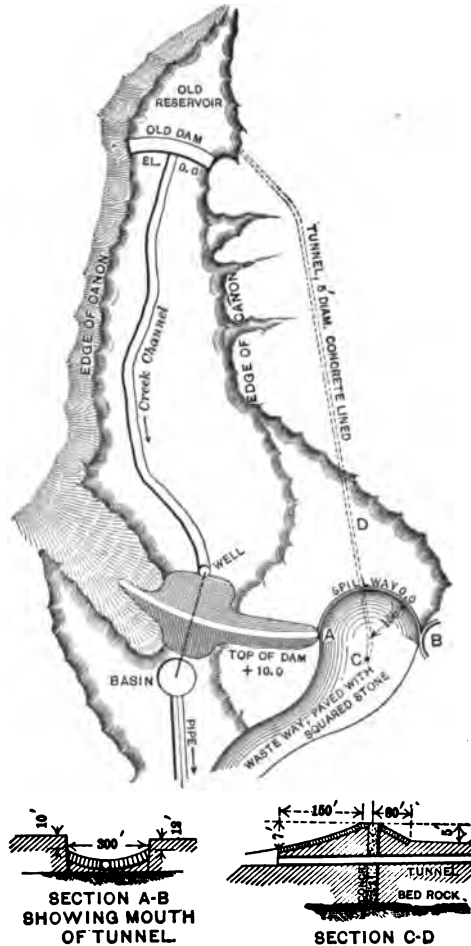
Plan of Santa Fé Reservoir, showing Arrangement of Wasteway and Cross-section of Waste-weir.
